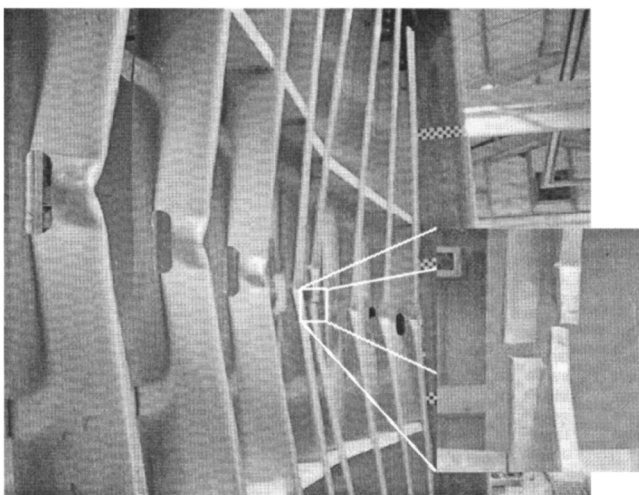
Typical wall after test—Studs developed full capacity signified by the rupture of a stud at the middle section
